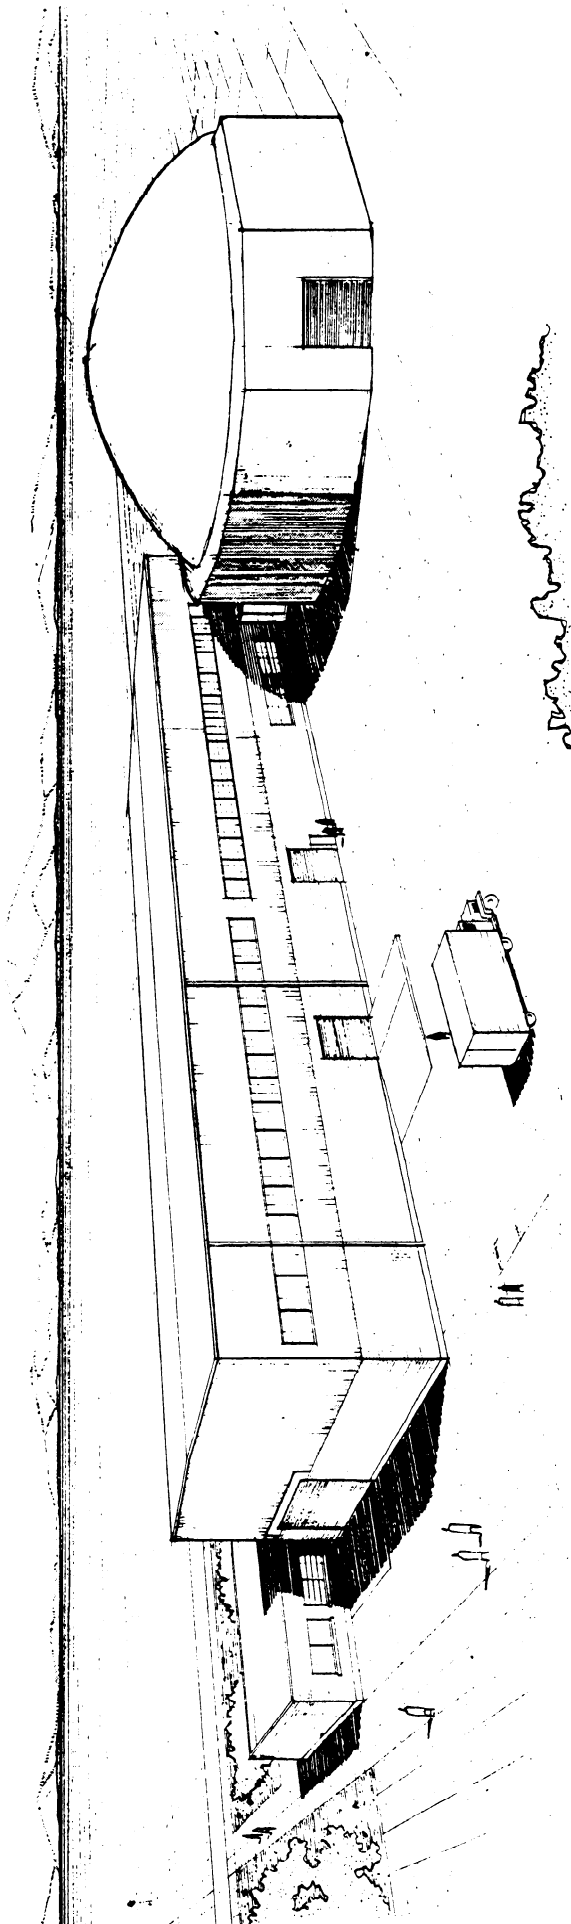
PLAN VIEW OF BUILDING 110
